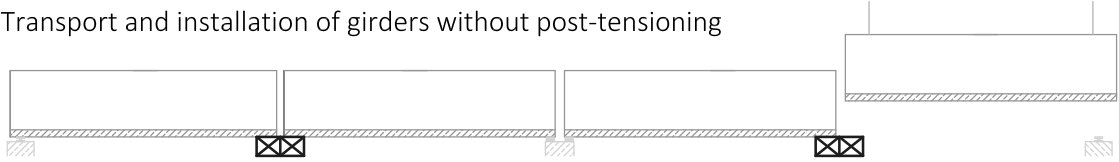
Transport and installation of girders without post-tensioning using auxiliary piers for the redesign of the L21 Overpass
